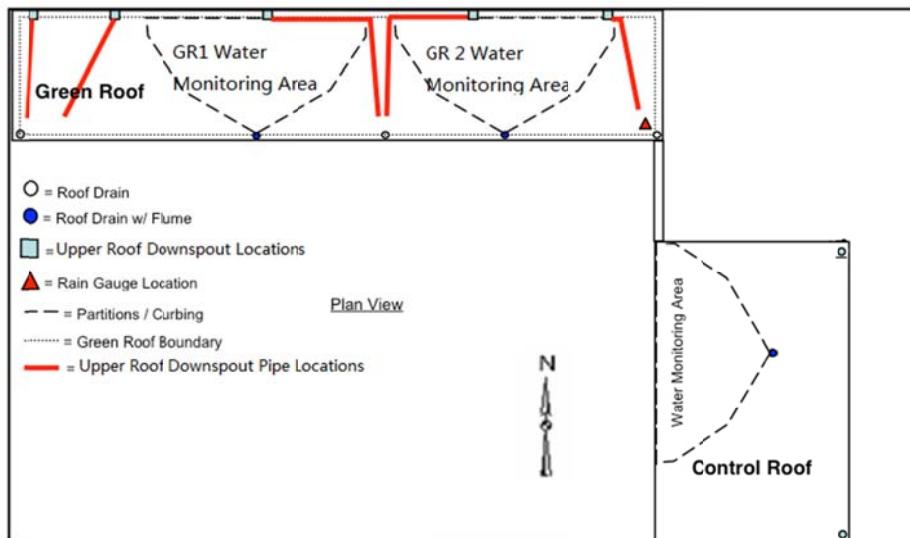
Plan view of the Hamerschlag Hall Green Roof and adjacent control roof with monitoring area locations. (Source: modified from Anumol et al., 2010)
